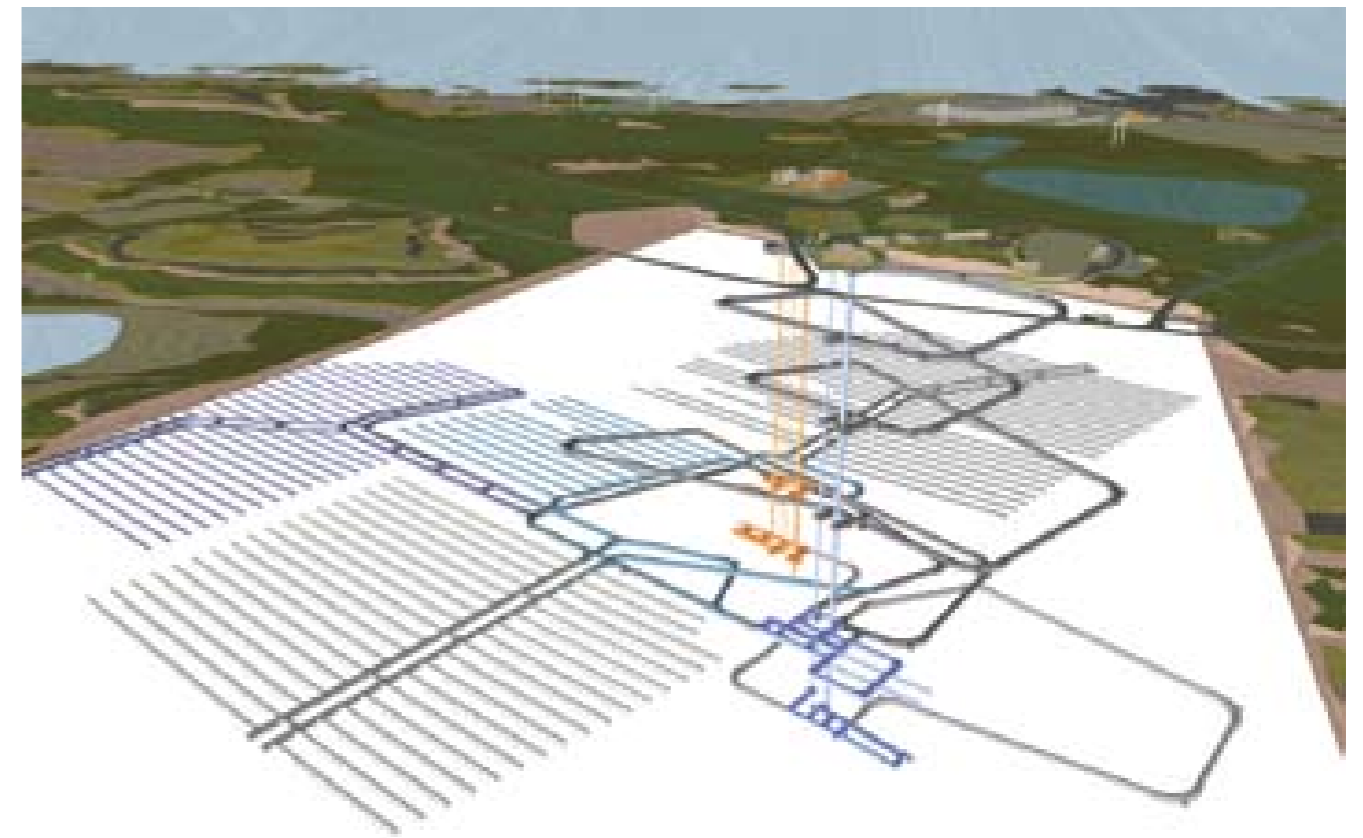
General picture of the final disposal facility above ground and underground (Posiva 2006).
